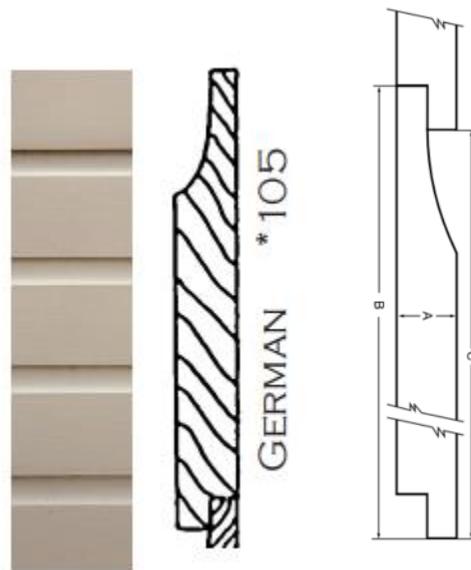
Typical German siding (left) & Proposed Cove/Dutch Lap siding (right)
